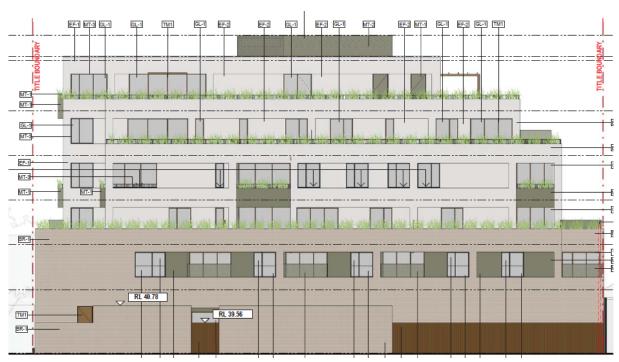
Southern elevation, showing the first floor balconies and windows screened to prevent overlooking.
